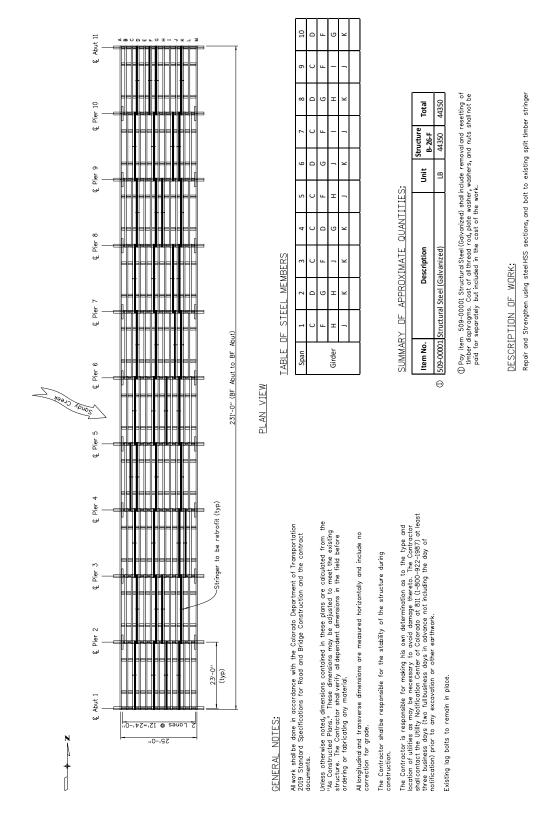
(H)-2 Example of General Layout for a timber stringer repair project
